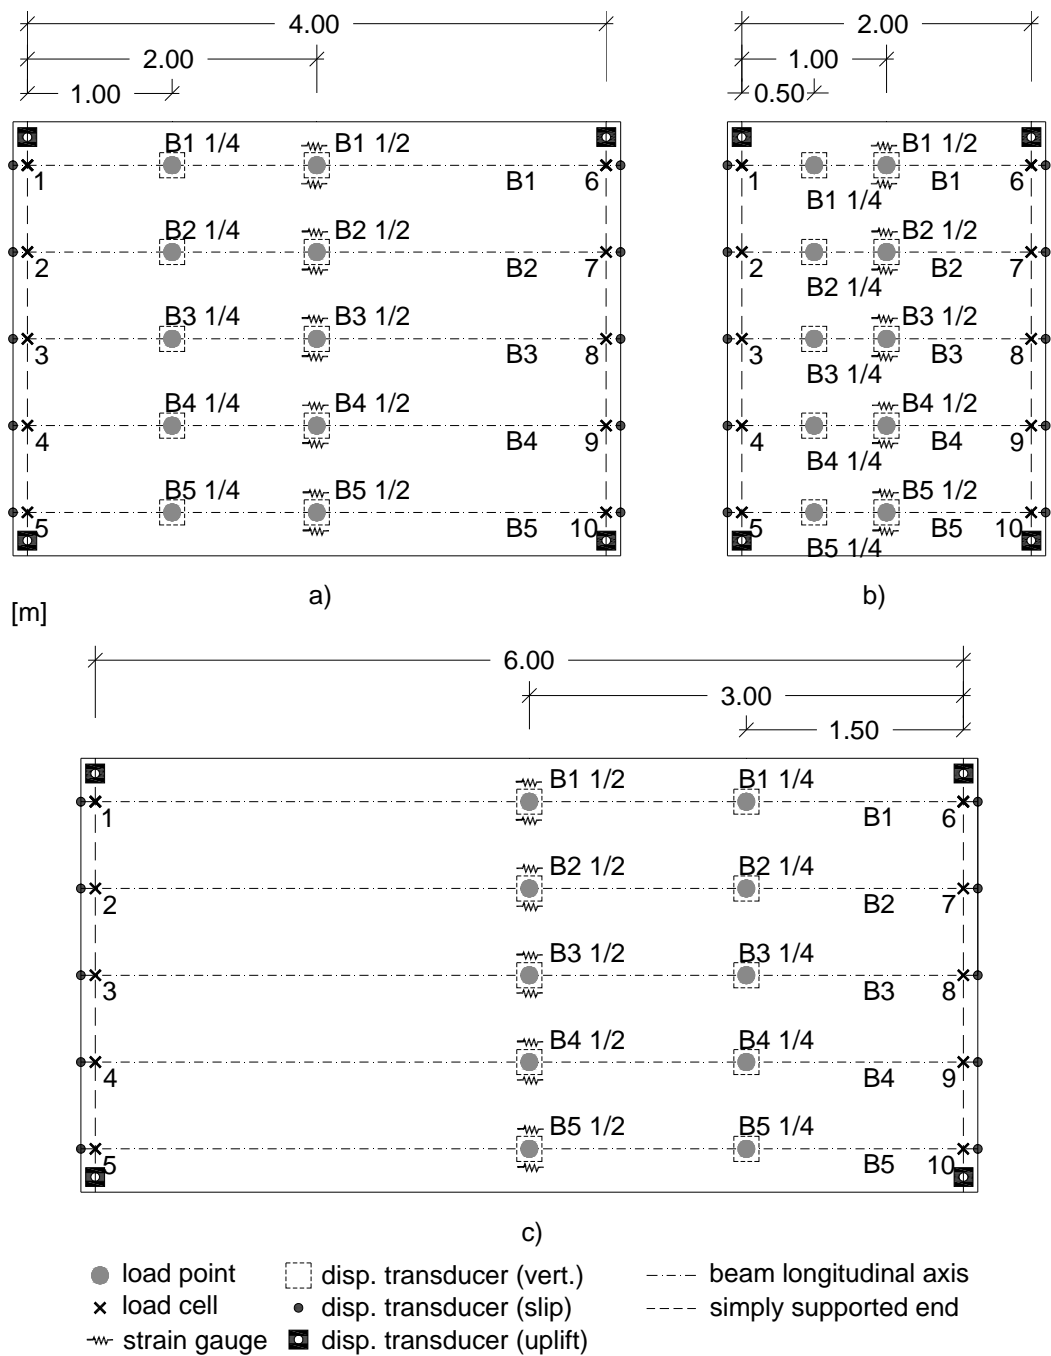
Test setup scheme, plan view: a) S1; b) S4 and c) S5
